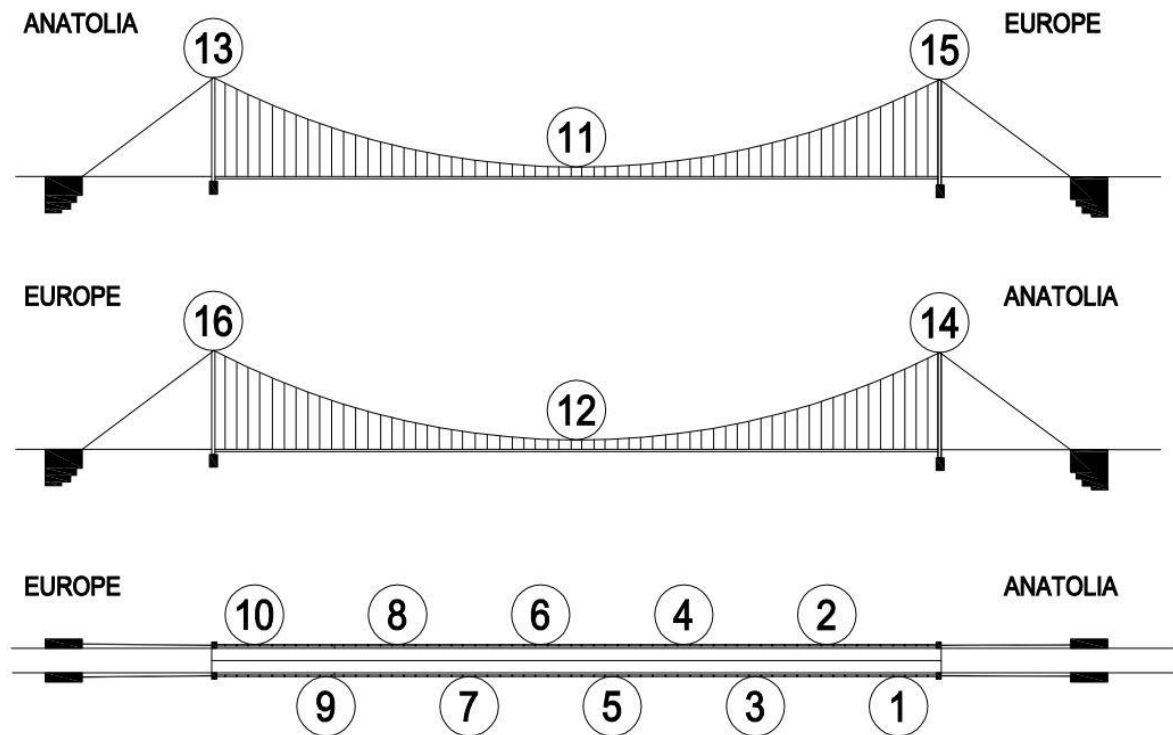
The layout of the permanent seismic network installation system on the bridge.
